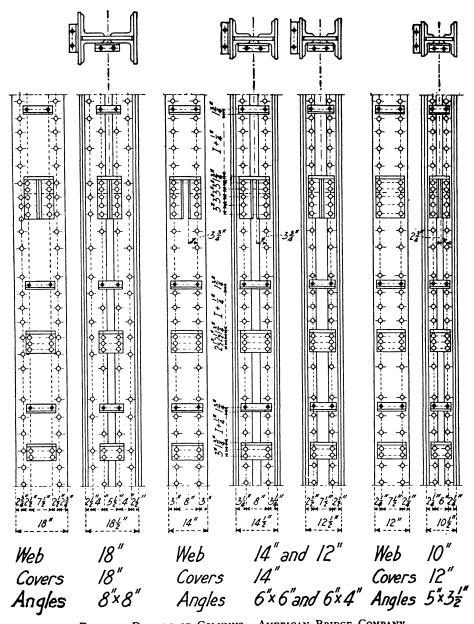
DETAILS OF COLUMNS. AMERICAN BRIDGE COMPANY.
